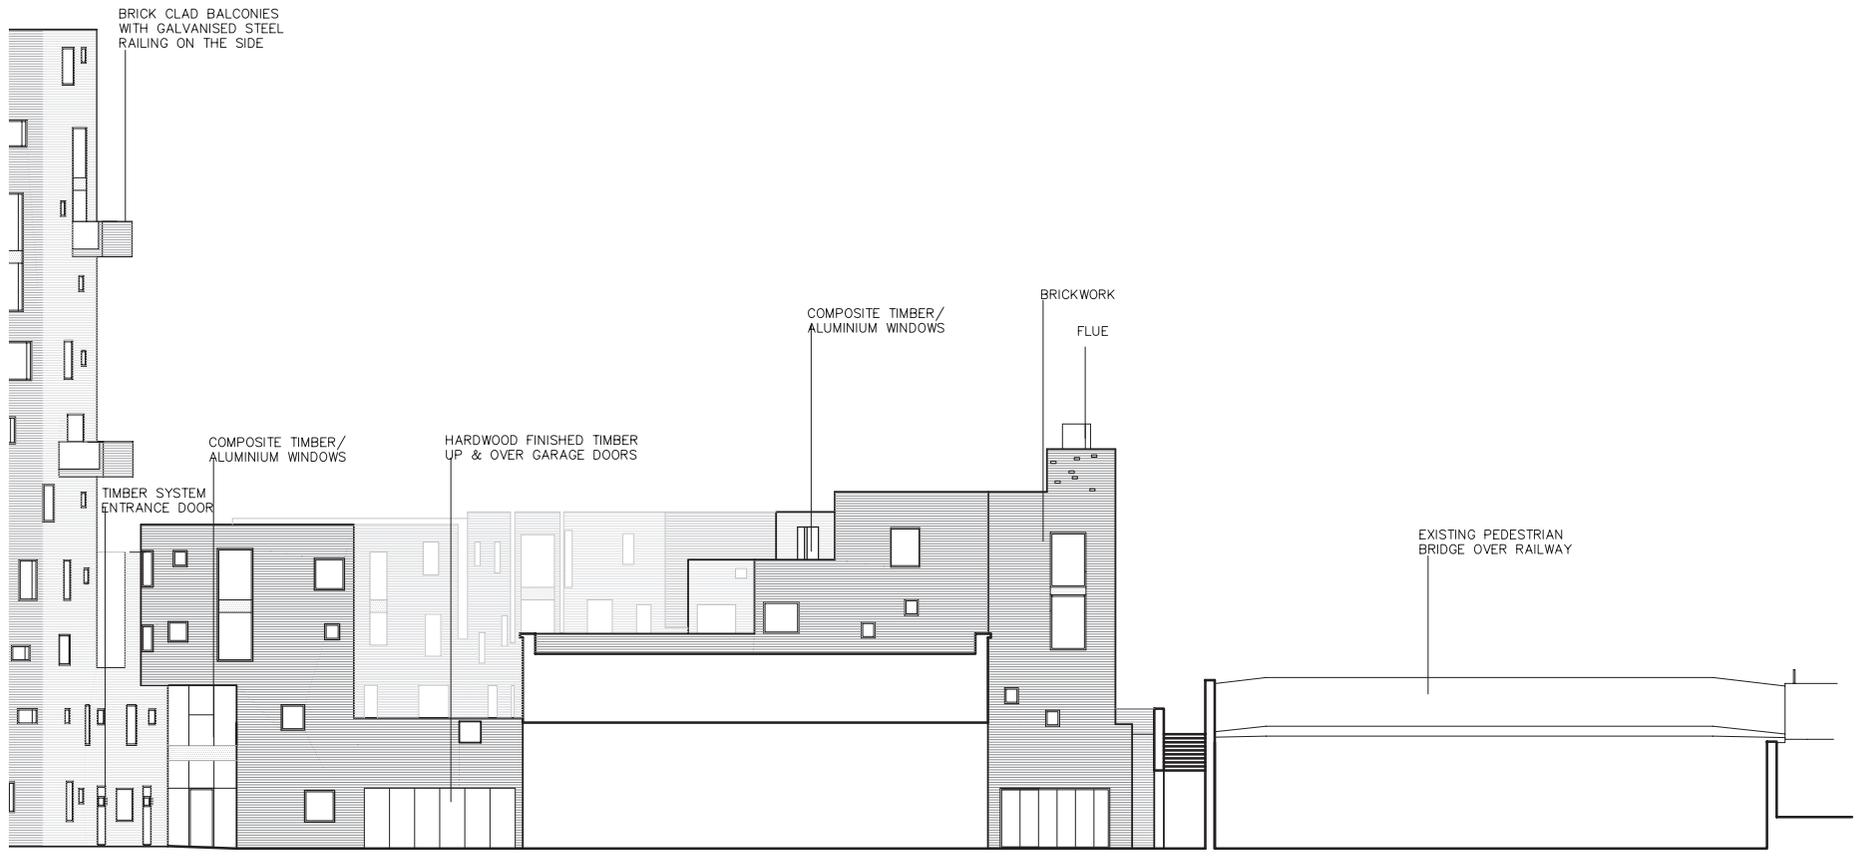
Fleet Street Hill: Elevations 3 and 4.
